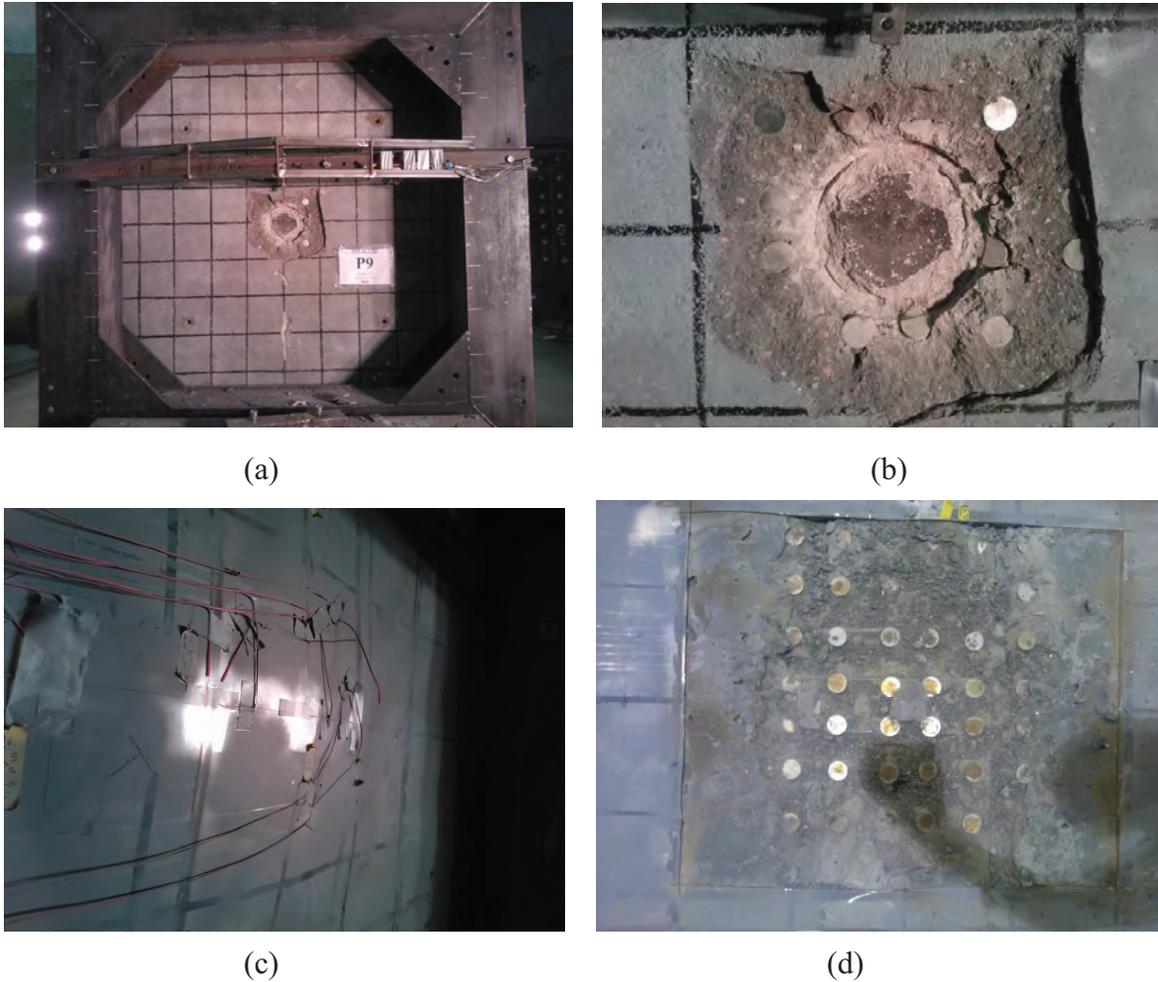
Specimen P9 after test, (top-left) Front face of the specimen after the test; (top-right) close-up view after the missile hit, (bottom-left) undamaged liner at the back face of the specimen; (bottom-right) close-up view of the back face of the concrete after removal of the liner and removal of the concrete cover
